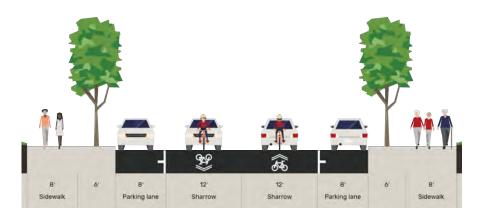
D: PROPOSED COLLECTOR - INDUSTRIAL STREET CROSS-SECTION (SOURCE: STREETMIX)
